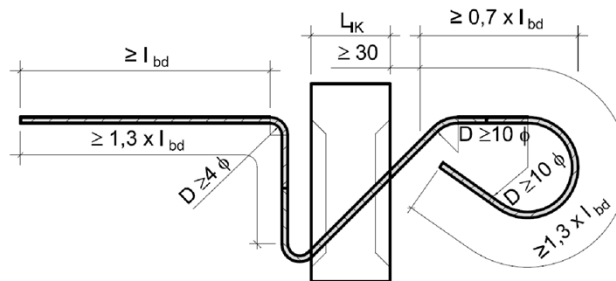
Shear force bar for Schöck Isokorb® Type K, K-F with bent up bar end on the balcony side and bent bar end on the ceiling side
